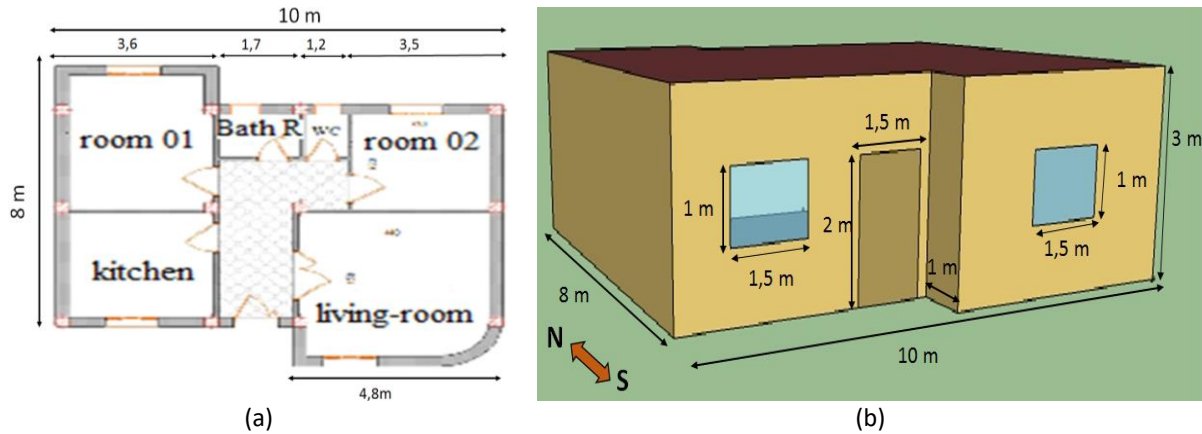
Geometry of the rural house studied in Algeria; (a) plan of rural building, (b) geometry realized in googleSketchup
